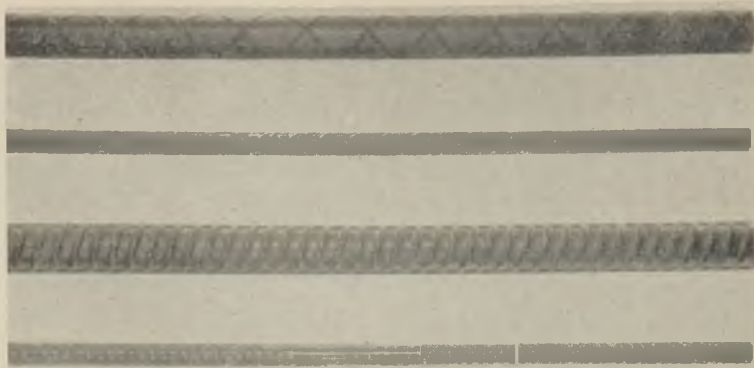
Reinforcing bars (2 No. 1 at top; 2 No. 2 below)
